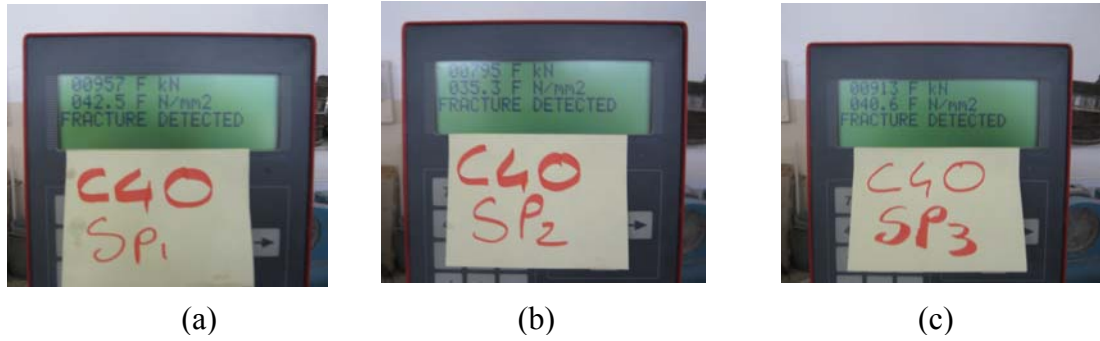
Trial results of concrete compressive strength of concrete mixture with a water/cement ratio of 0.40: (a) First specimen; (b) Second specimen; (c) Third specimen.
